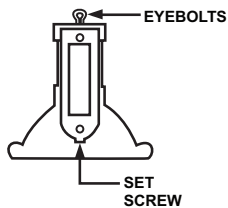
Tilting accessories are not required. Simply adjust set screw at one end to achieve desired degree horizontal tilting. Eyebolts with holes for chain-mounting are provided.
